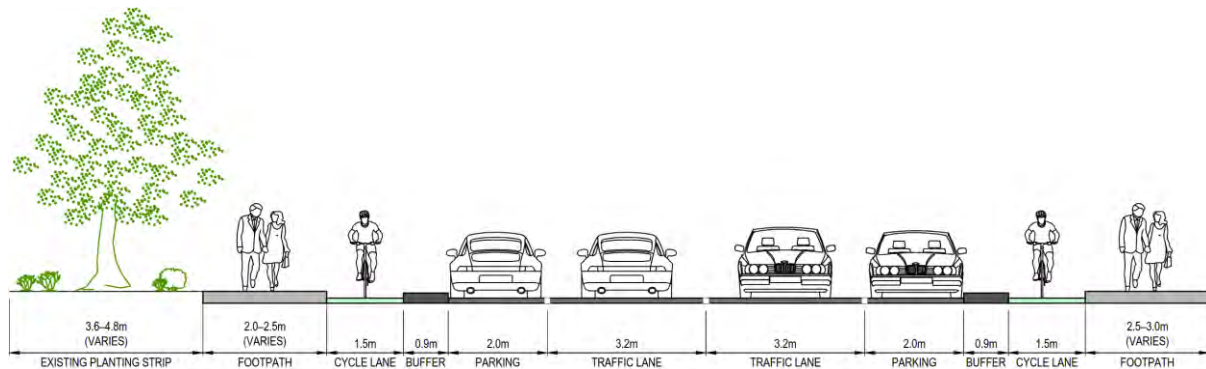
Cross Section 1 – Recommended residential cross section for the short-term upgrades (between Dee Street and the north side of the town centre, and between Trent Street and Reef Street)
